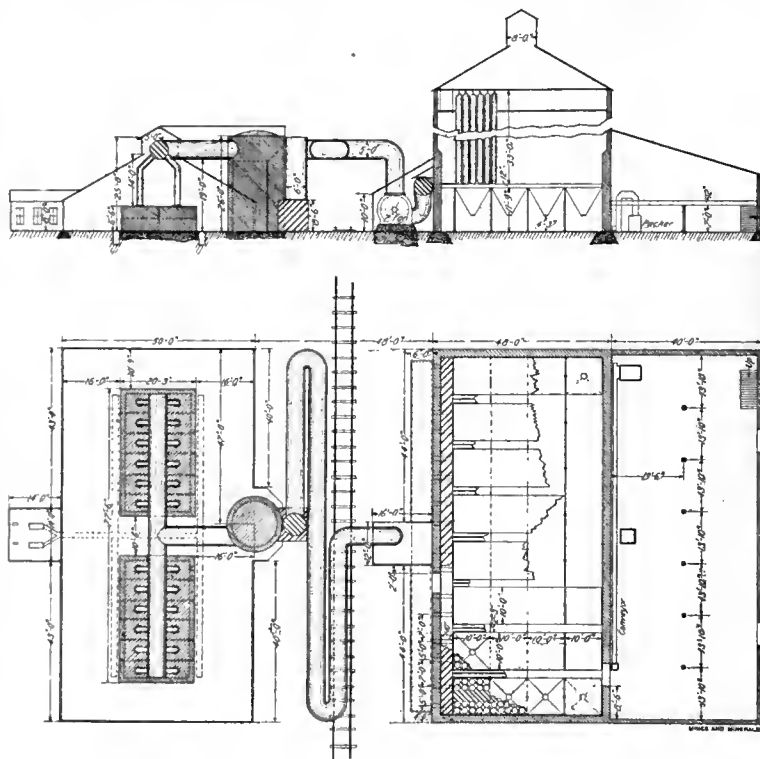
PLAN AND ELEVATION OF ZINC-LEAD PIGMENT PLANT
